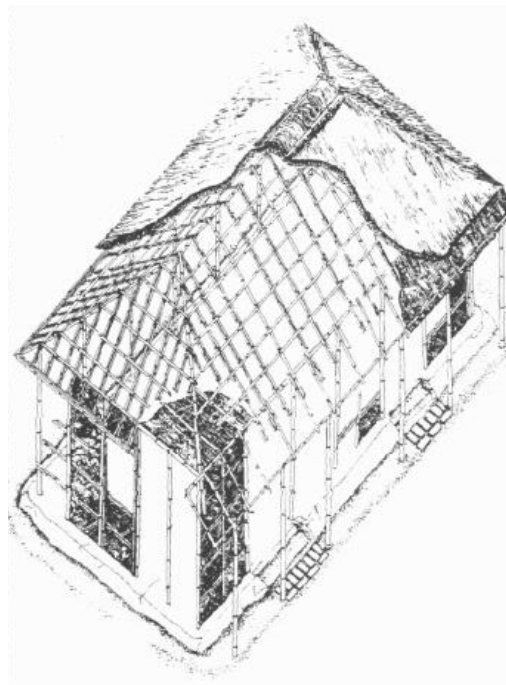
Bamboo frame house (Ranjan et al. 1986).
